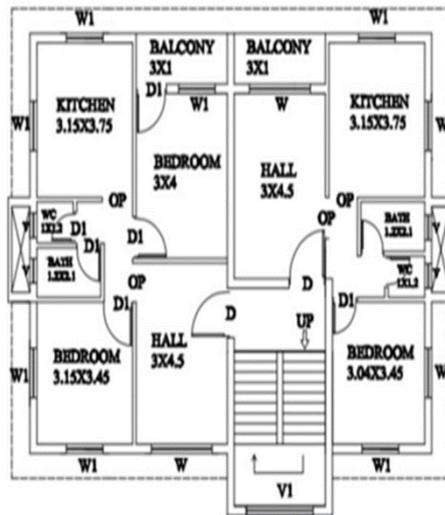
Typical floor plan 1st, 2nd, and 3rd
